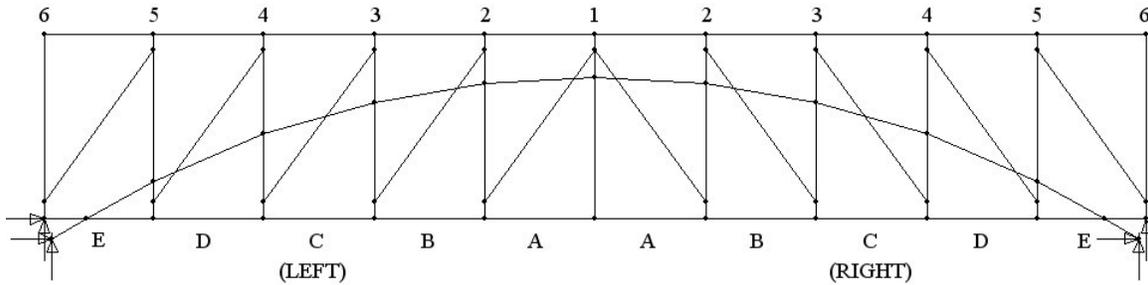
Center-line Model of Arch-Truss with Labeling System.
